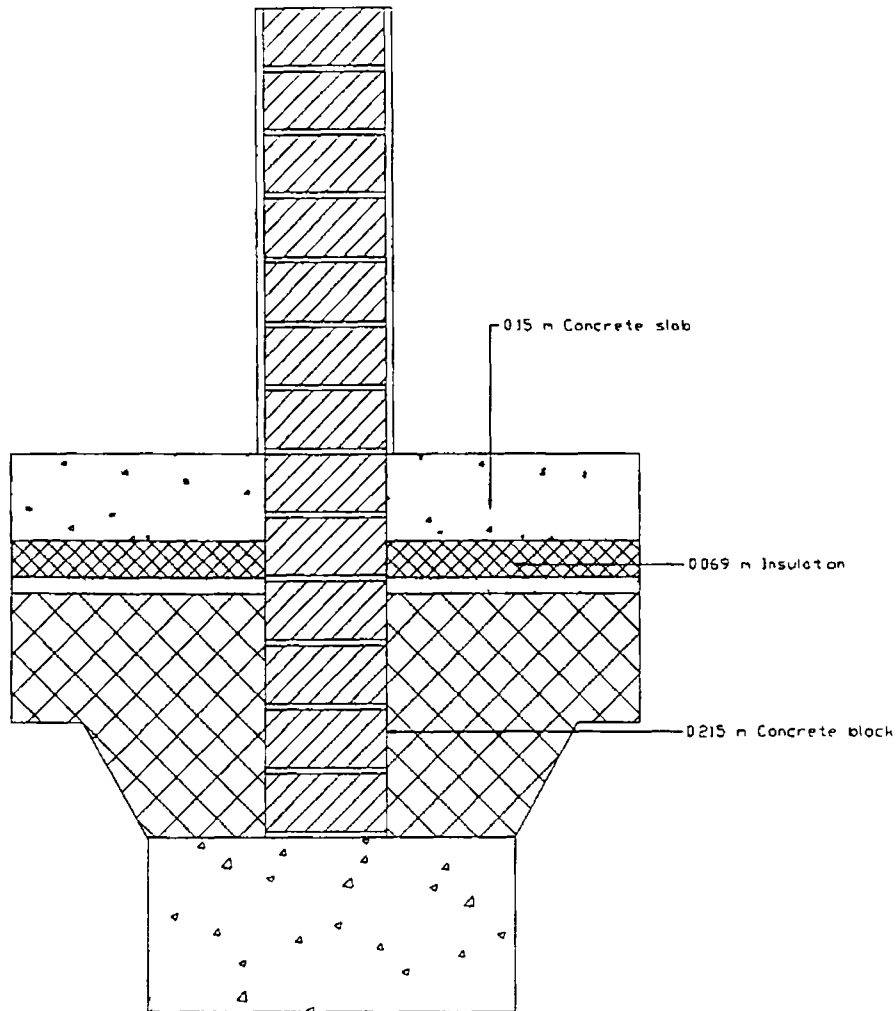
9 1 Semi-Detached House Party Wall to Foundation
